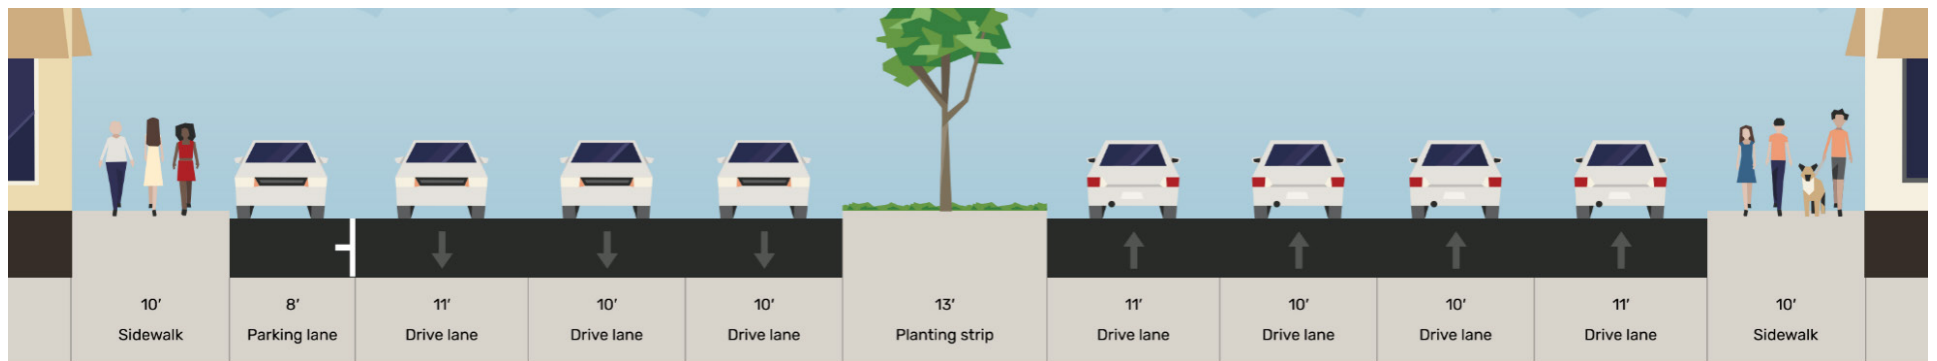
Existing cross-section: Rosecrans Ave from Aviation Blvd to east of Condon Ave
